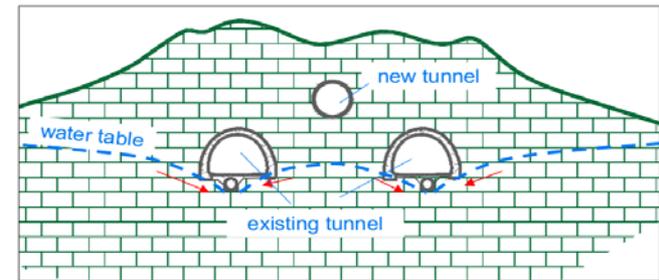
Hydrogeological scheme (not in scale) of the existing motor-way tunnels and of the new tunnel. Red arrows show drainage by the existing tunnels.
